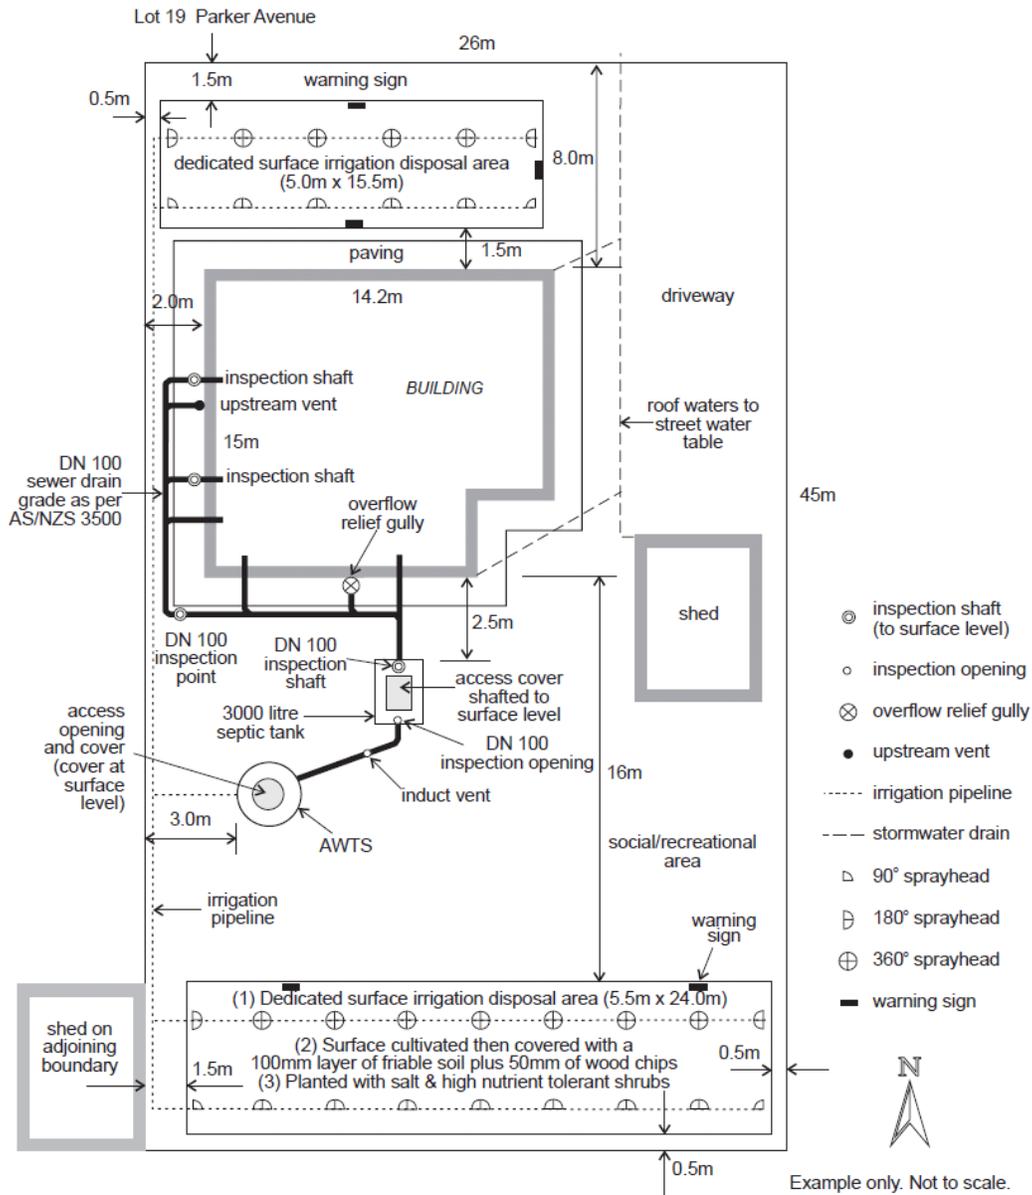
Typical site layout plan for an aerated wastewater treatment system and surface irrigation
